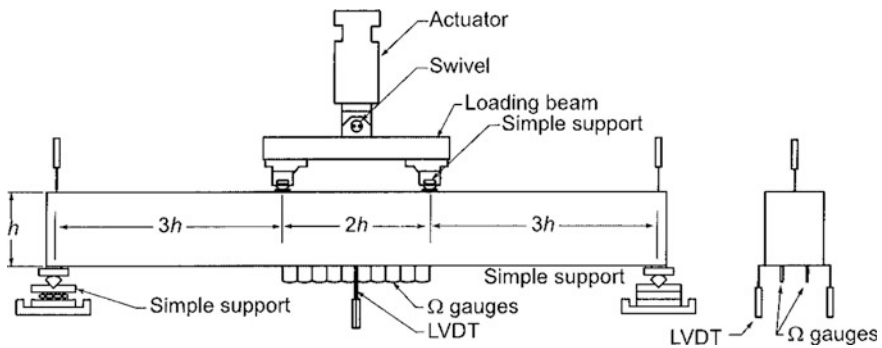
Beams’ dimensions, testing apparatus and instrumentation related to the experimental tests
